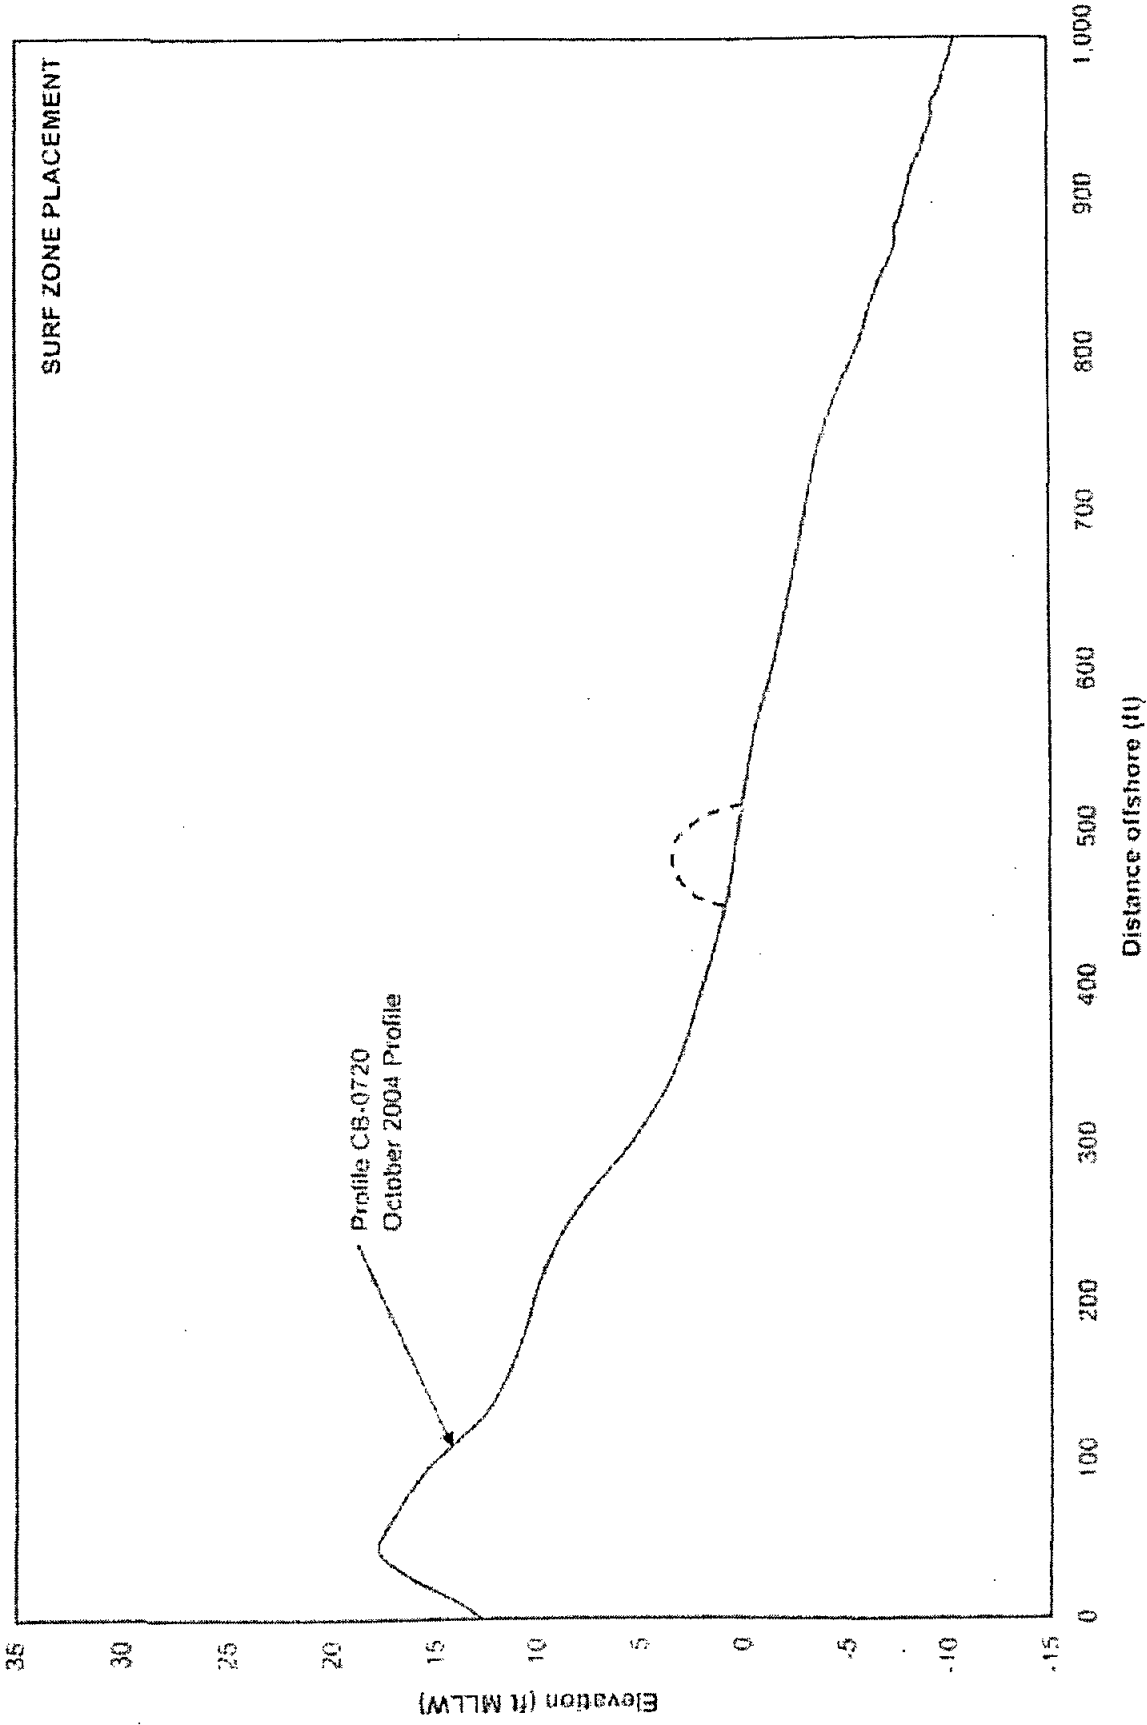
Batiqitos Beach Typical Cross Section – Surf Zone Placement
